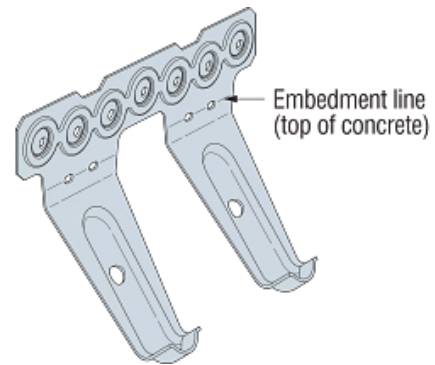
MASOPZ FOUNDATION ANCHOR STRAP
